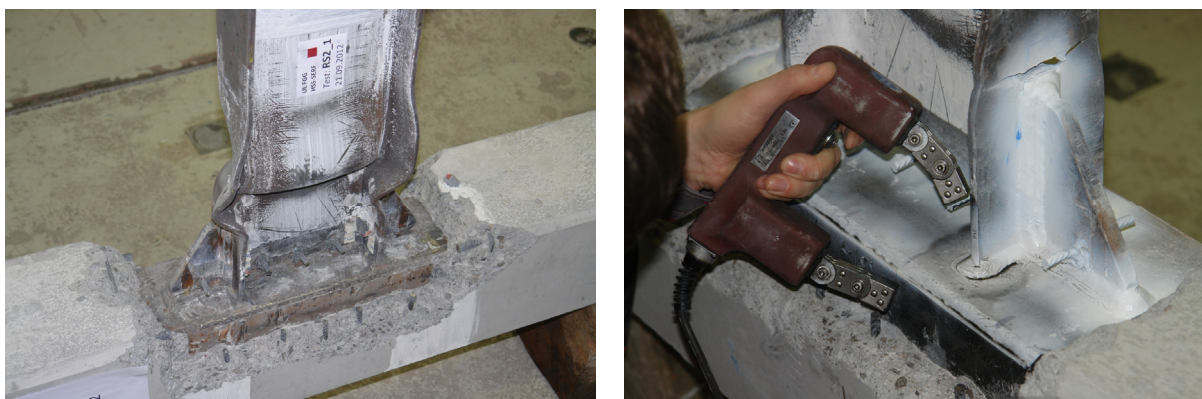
a) Preparation of specimen for welded connection inspection, b) Magnetic particle testing (MT)
